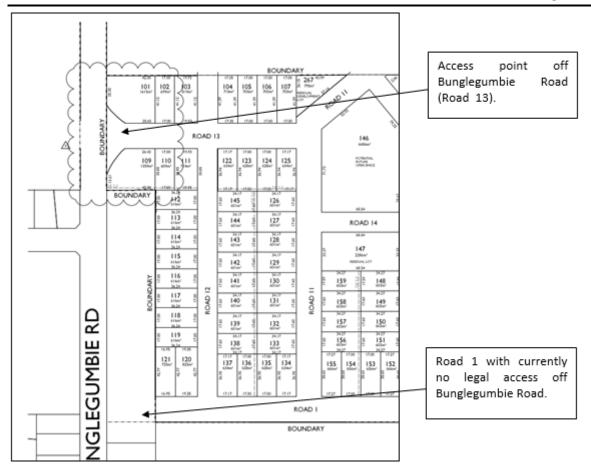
Submitted Subdivision Plan with vehicle access onto Bunglegumbie Road outlined
